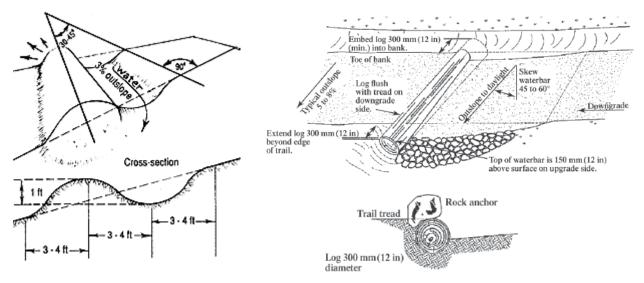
Earthen-berm waterbar from MN Extension Service(left); log waterbar from USGS(right). We do not recommend the top of the log being left flush with downhill surface or skewing waterbar at an angle greater than 45 degrees. Note: Our applications for Calabash Boom Rd. are for diverting flow to the inside ditch, these diagrams show diversion to outs
